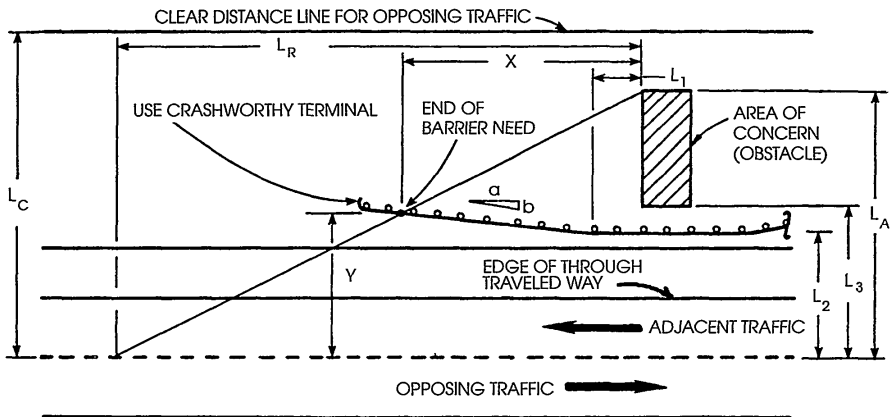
Approach Barrier Layout for Opposing Traffic
